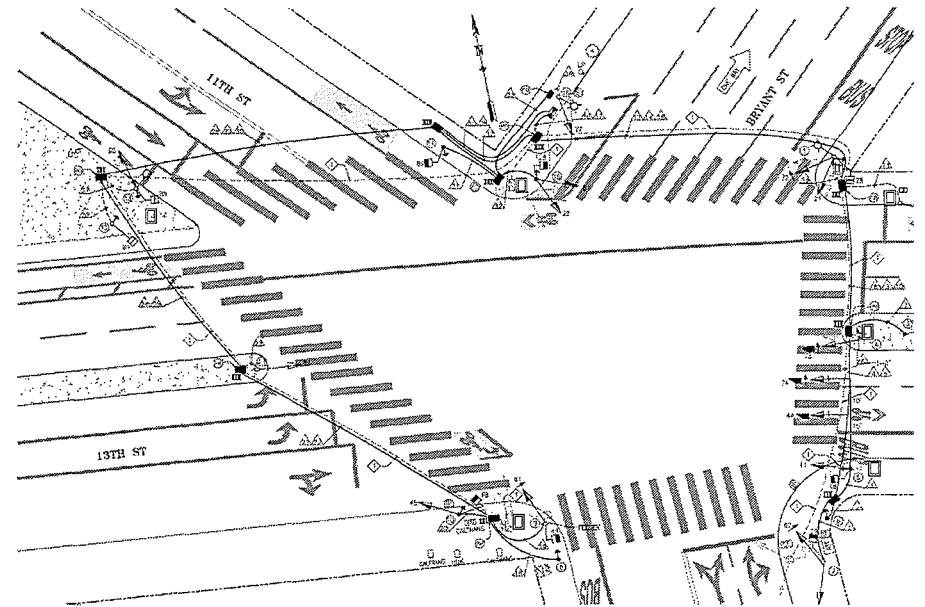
A – 13th Street EB Bicycle Facility - Striping Plan
